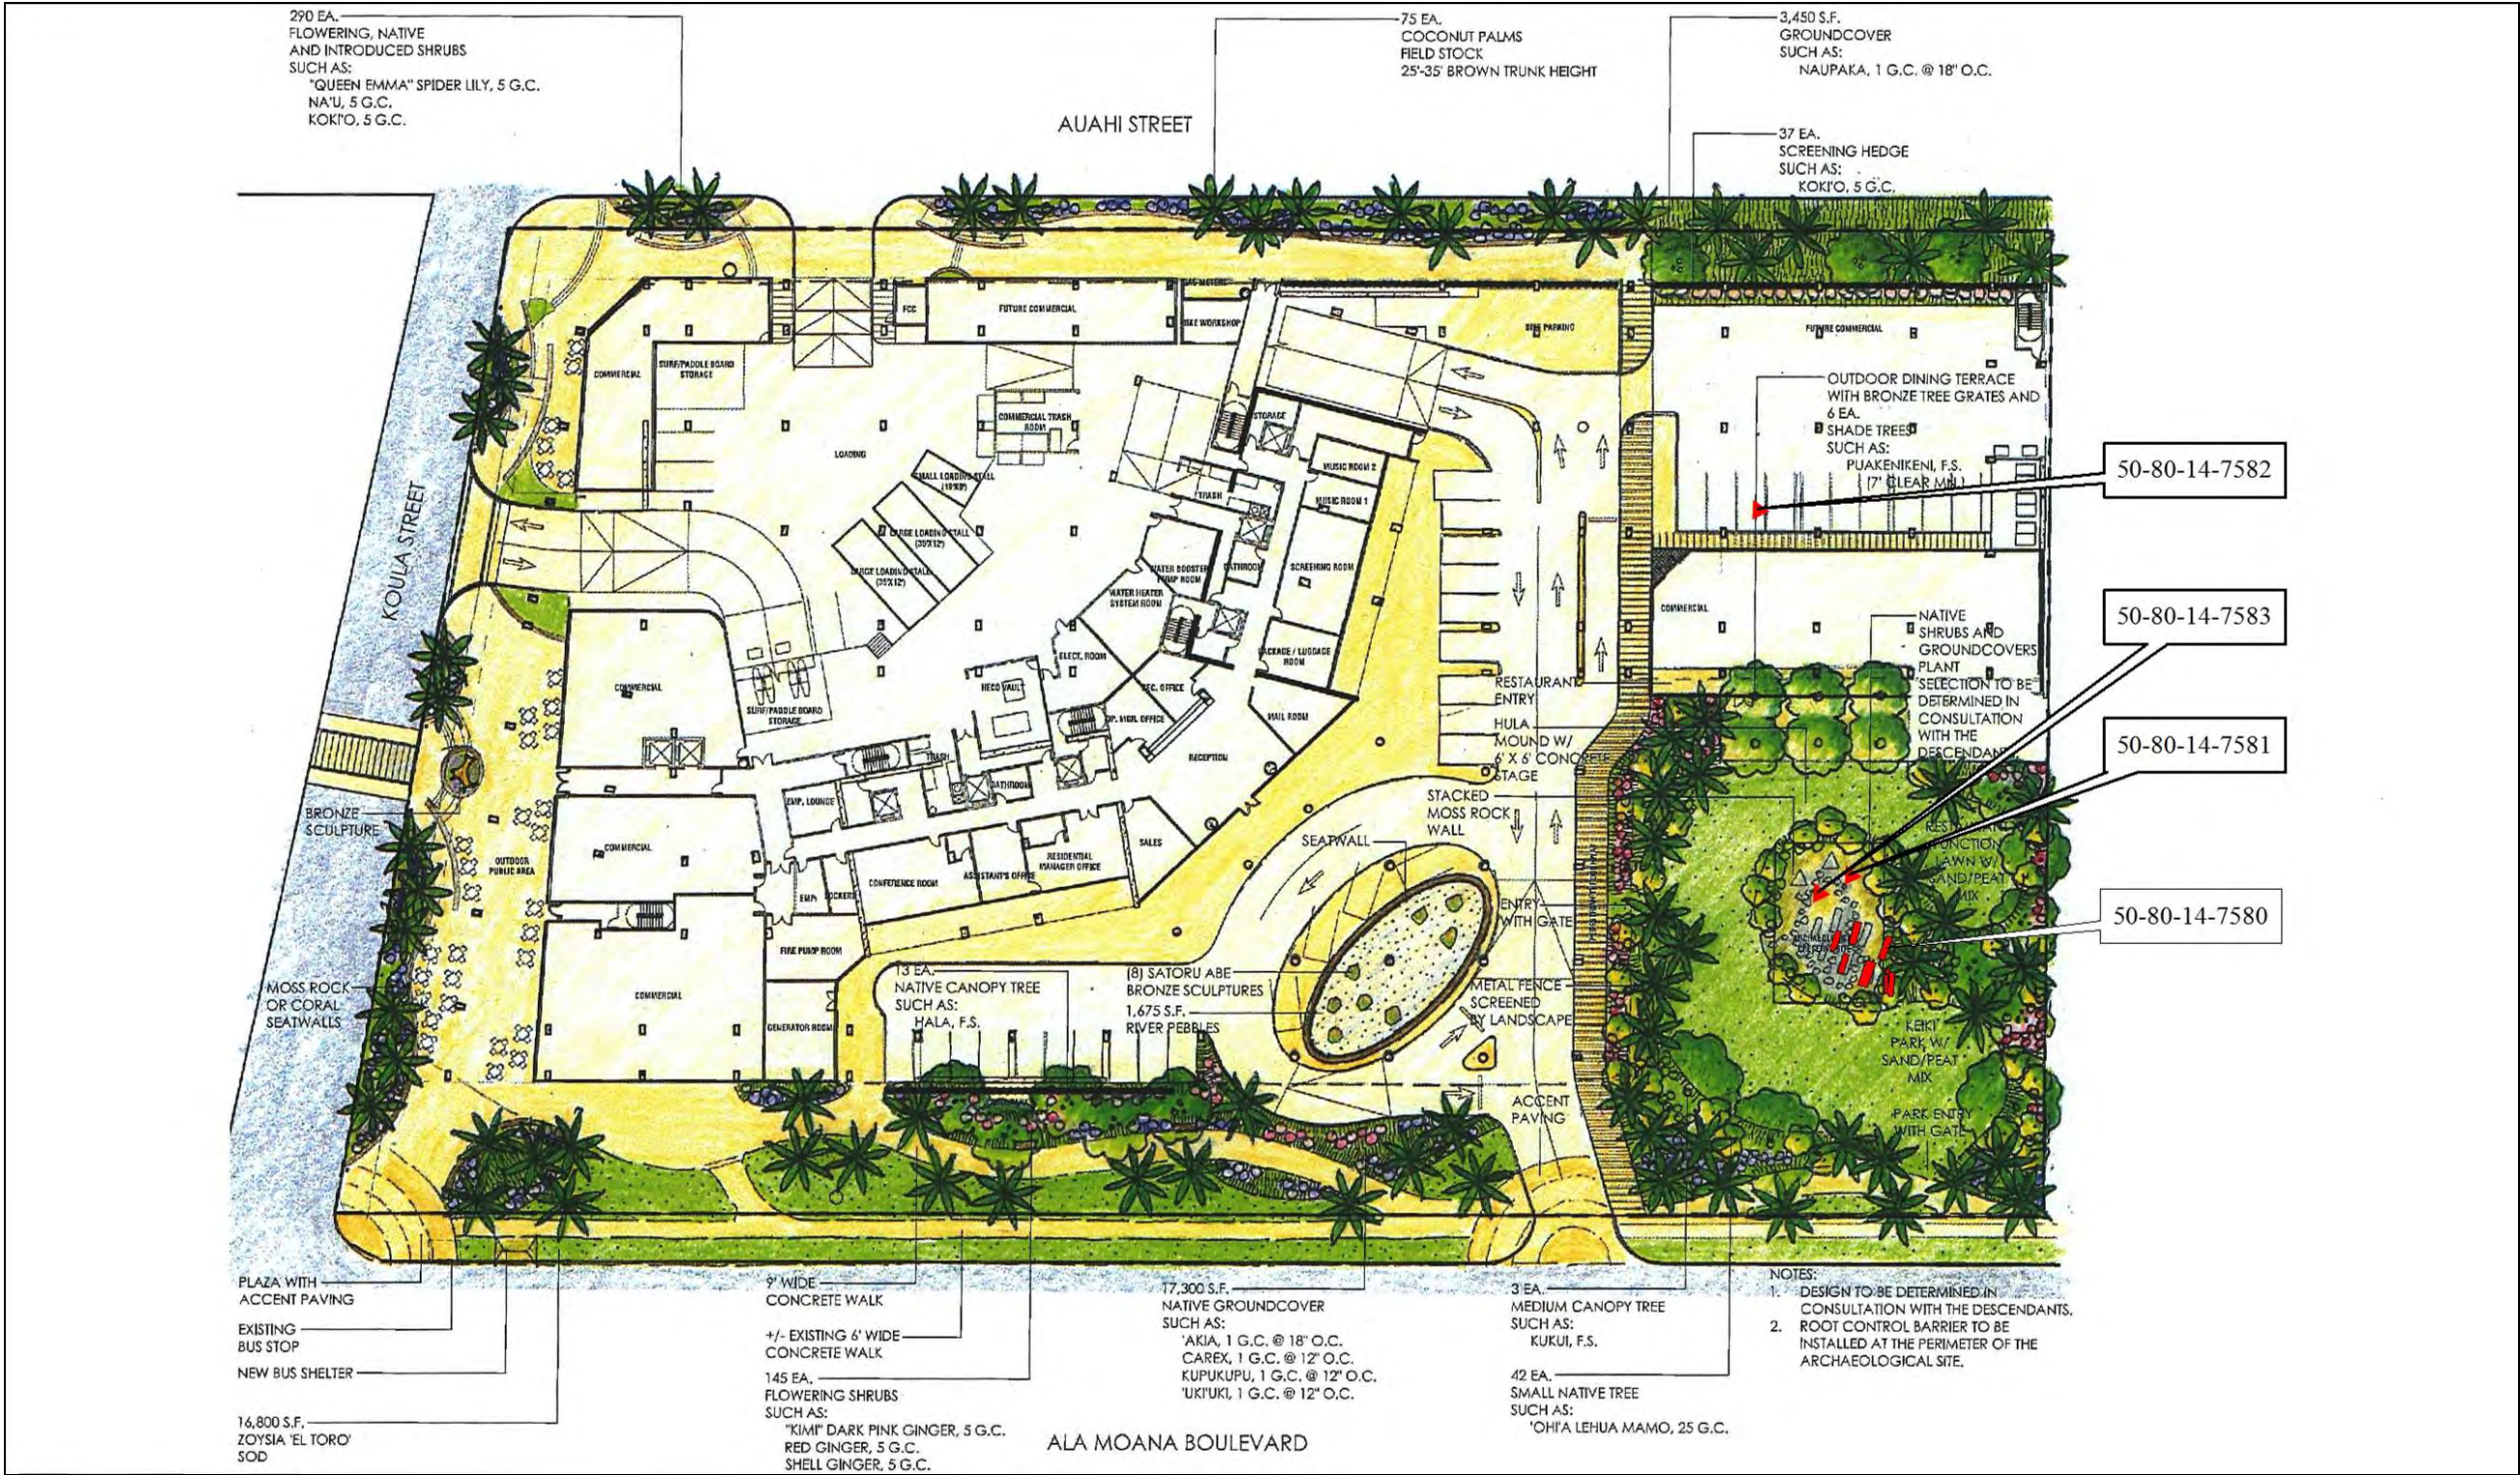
Block I Landscape Plan detailing proposed redevelopment (source: MK 2014) showing the location of SIHP #'s 7580, -7581, -7582, and -7583
